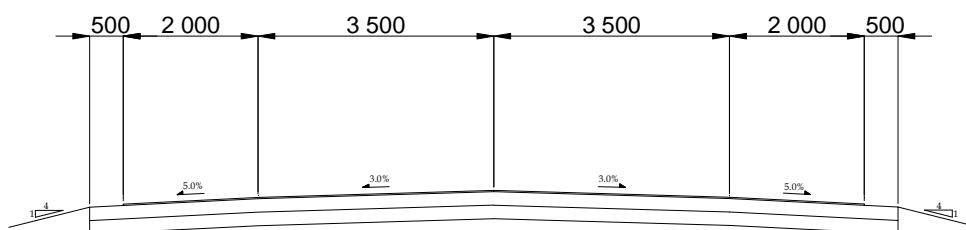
Typical Cross Section of Nampula – Nacala Road (Town Section)
